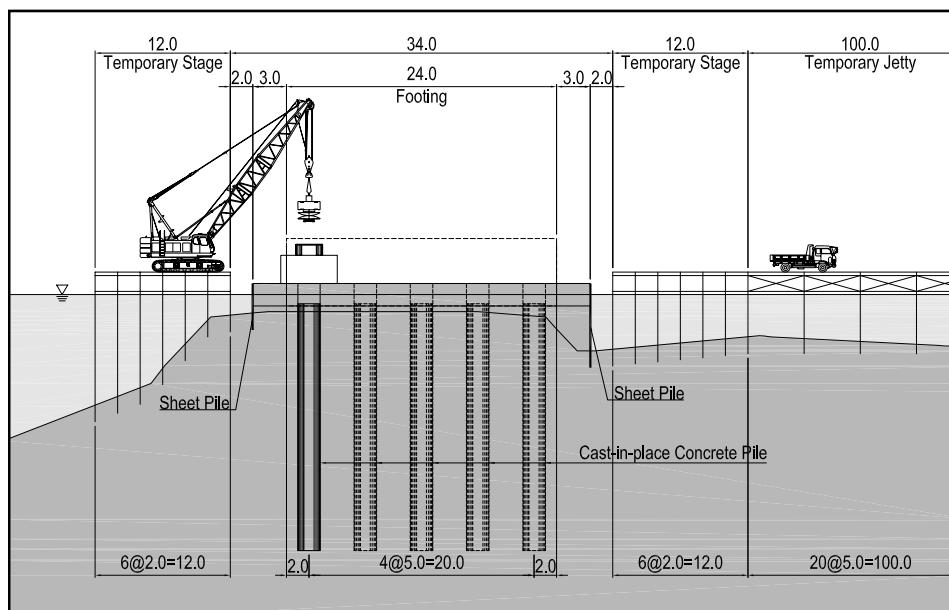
Methodology for the Construction of the Foundation for the Jinja Side
